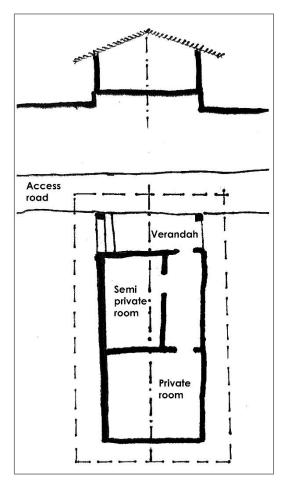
A plan and section of a typical Koli house with its long verandah.(Author)
